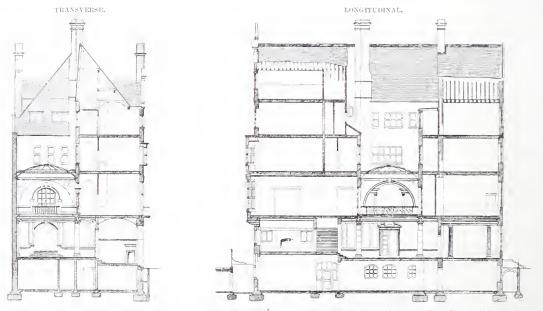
SECTIONS OF A CORNER HOUSE AT QUEEN'S GATE. R. NORMAN SHAW, R.A., ARCHITECT, 1891.
